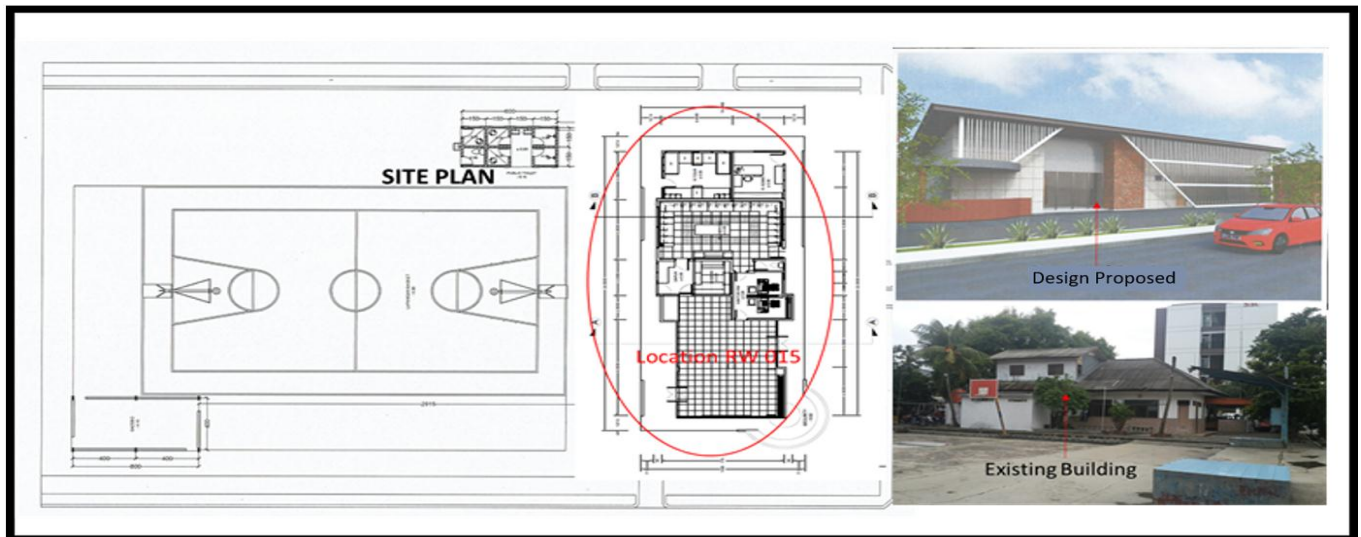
Site plan, existing building, and 3D proposal design of RW 015 office building
